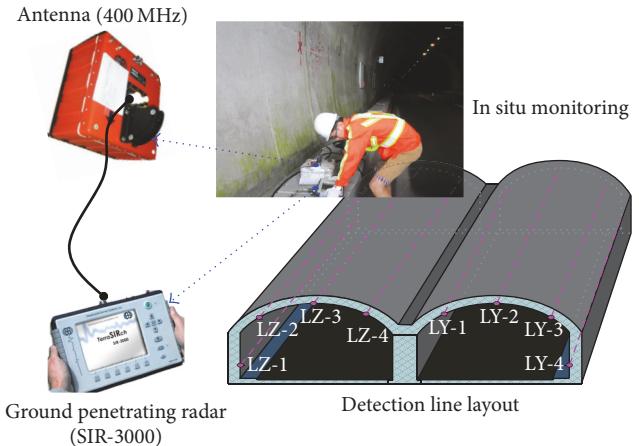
Detection line layout for voids behind the tunnel liner.
